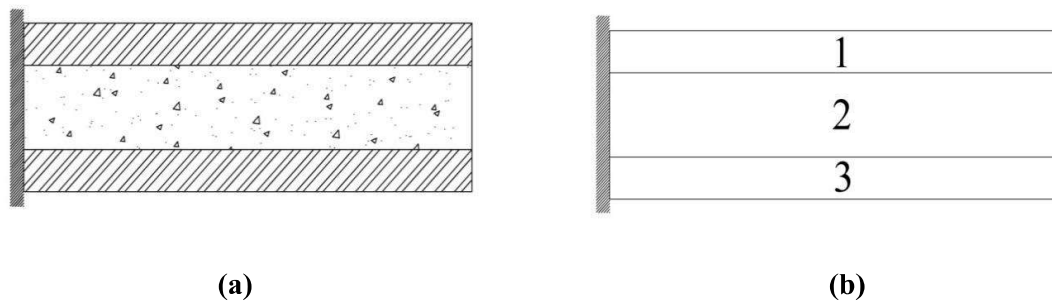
(a) SCS sandwich cantilever beam (b) Division of the model into design elements 1, 2, and 3.
